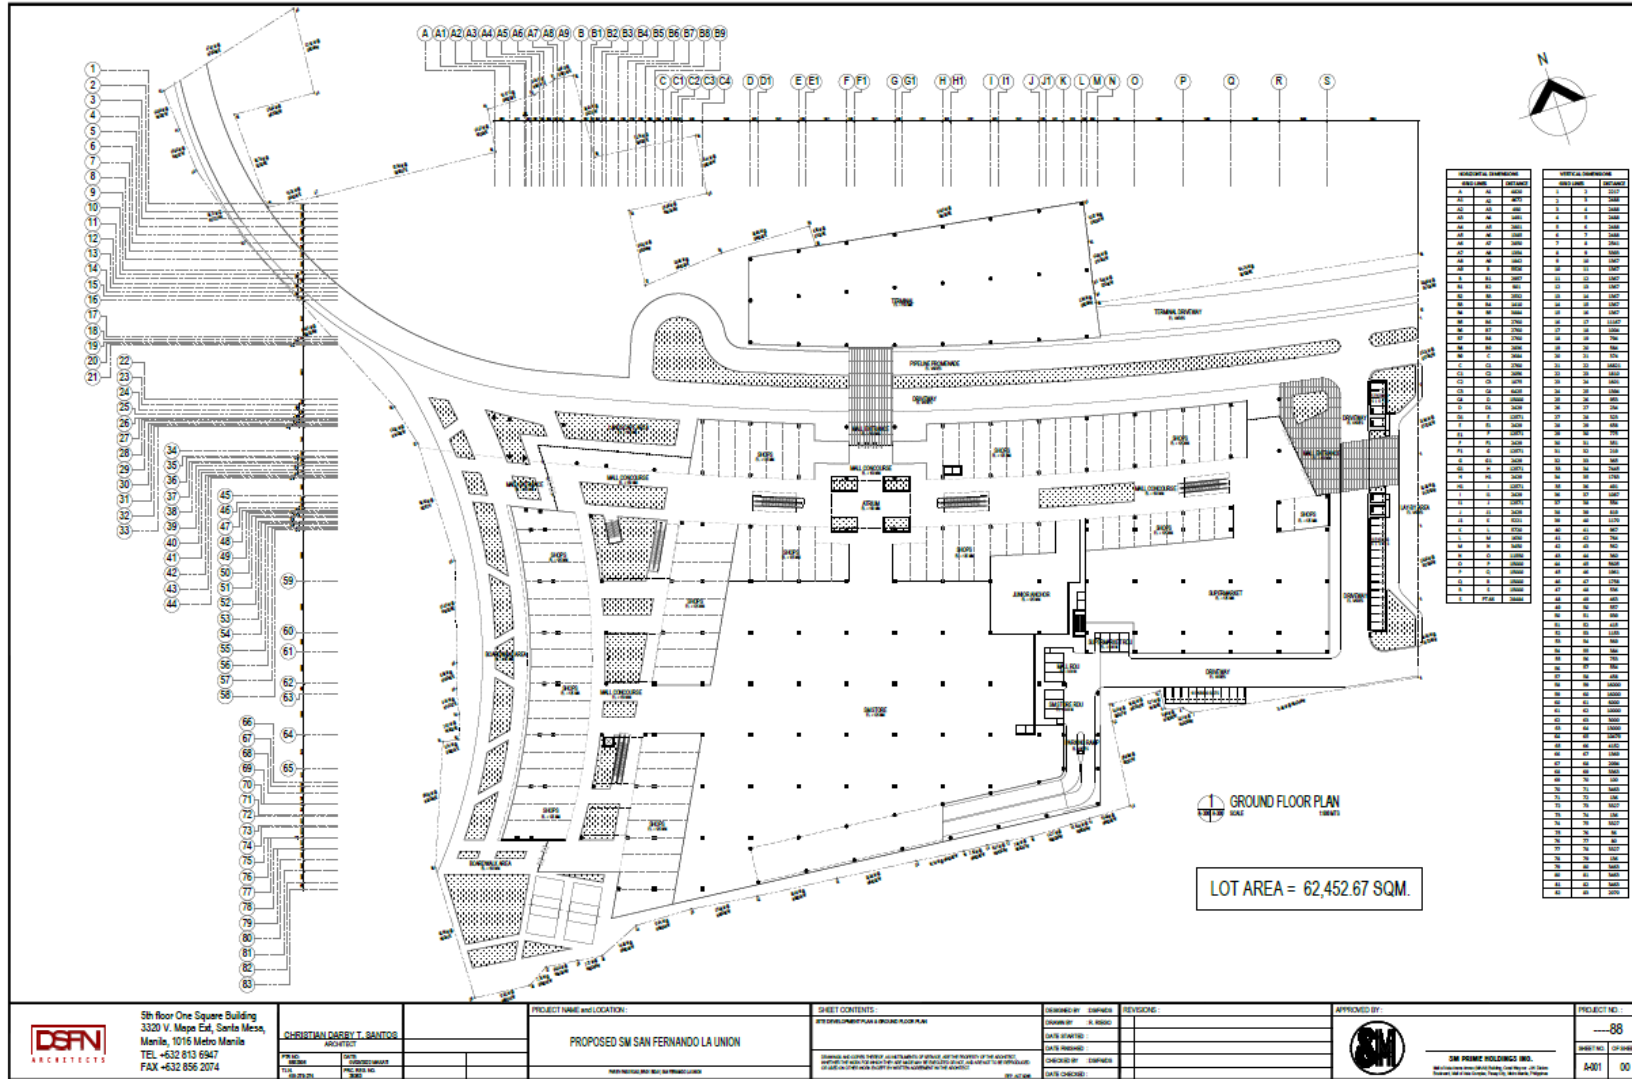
Site Development Plan of the proposed SM City La Union Project
